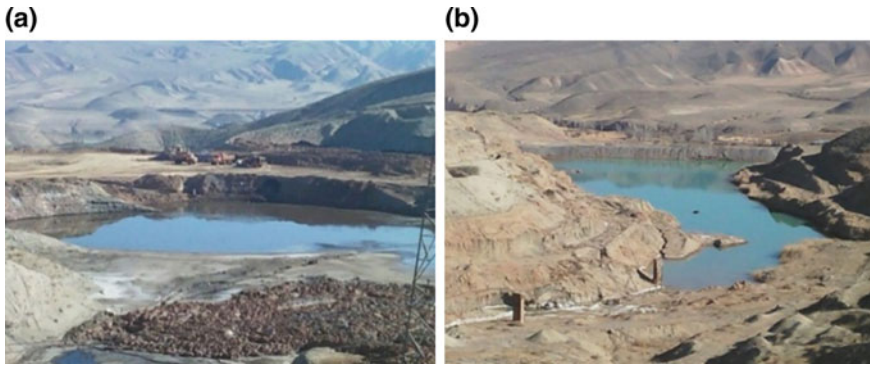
a Leaching plant tailing dam, b floatation tailing dam (M. Heydari 01/11/2017)
